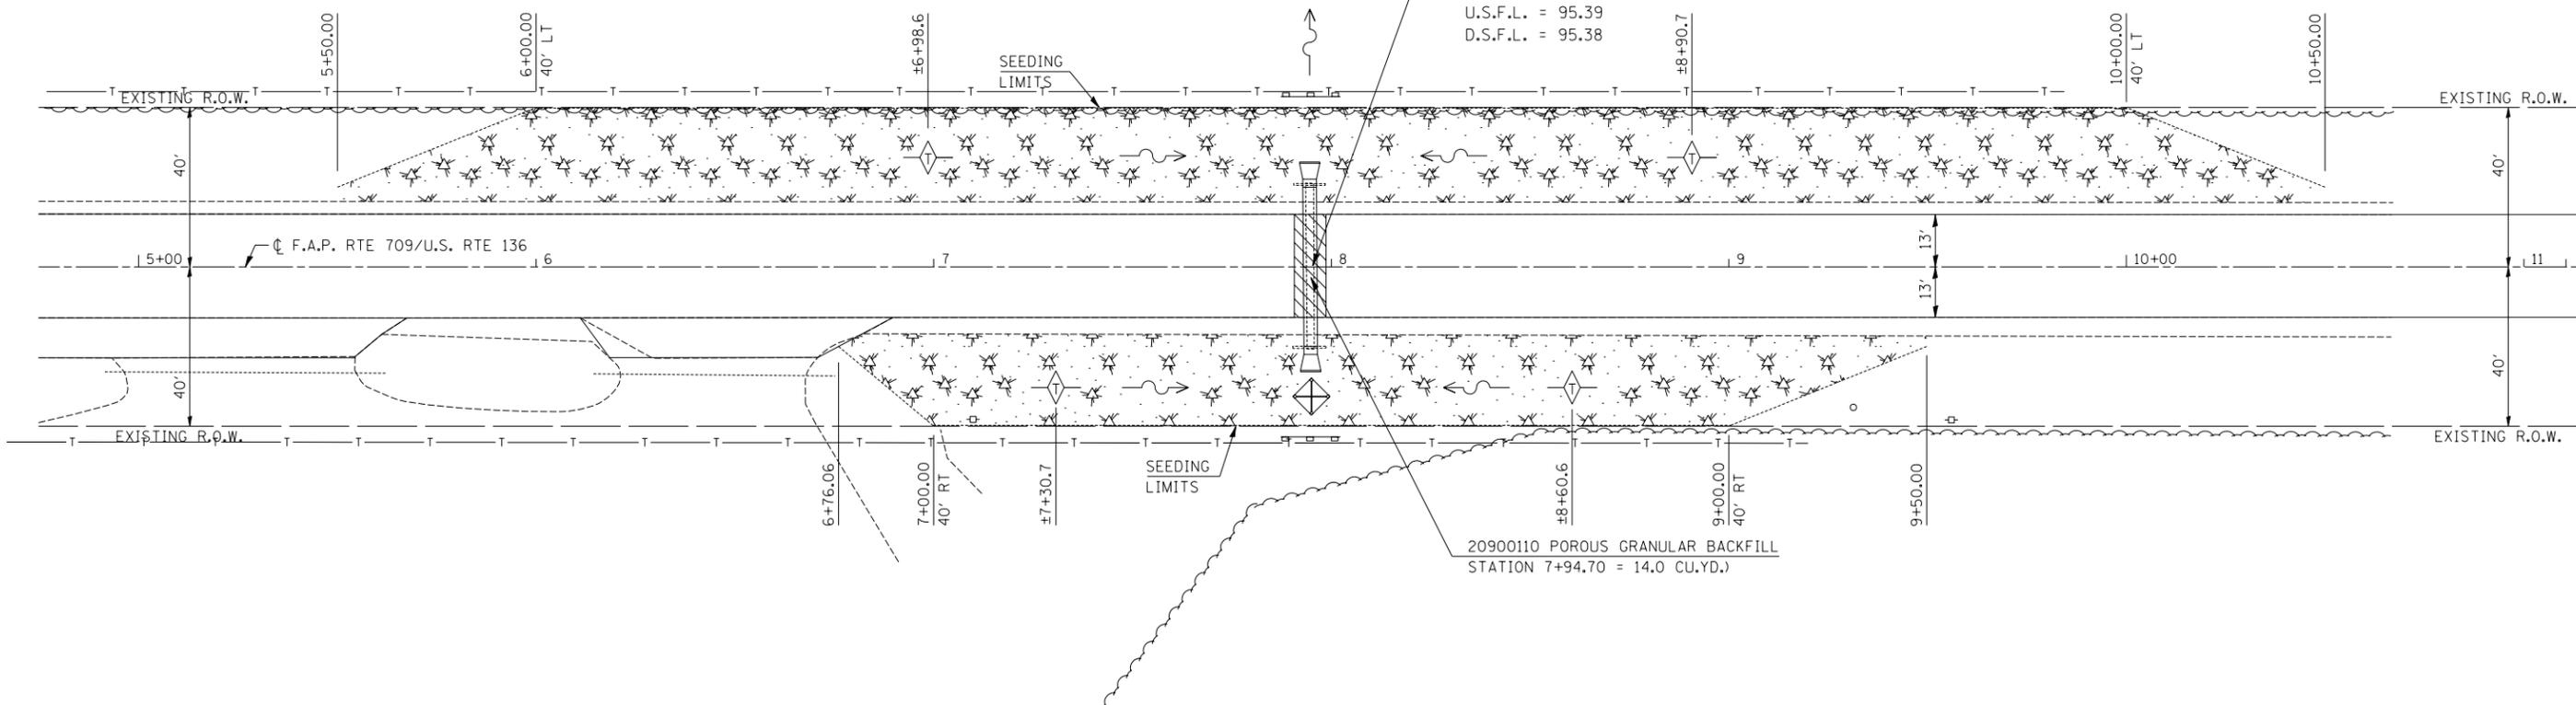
DETAIL OF ACROSS ROAD CULVERT STATION 7+94.70
